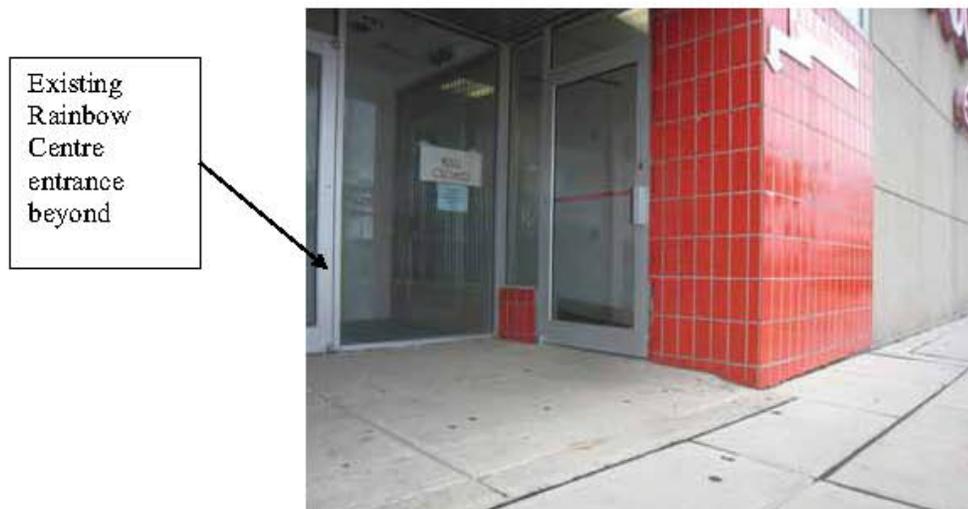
View of existing entrance to elevator lobby along Rainbow Boulevard
